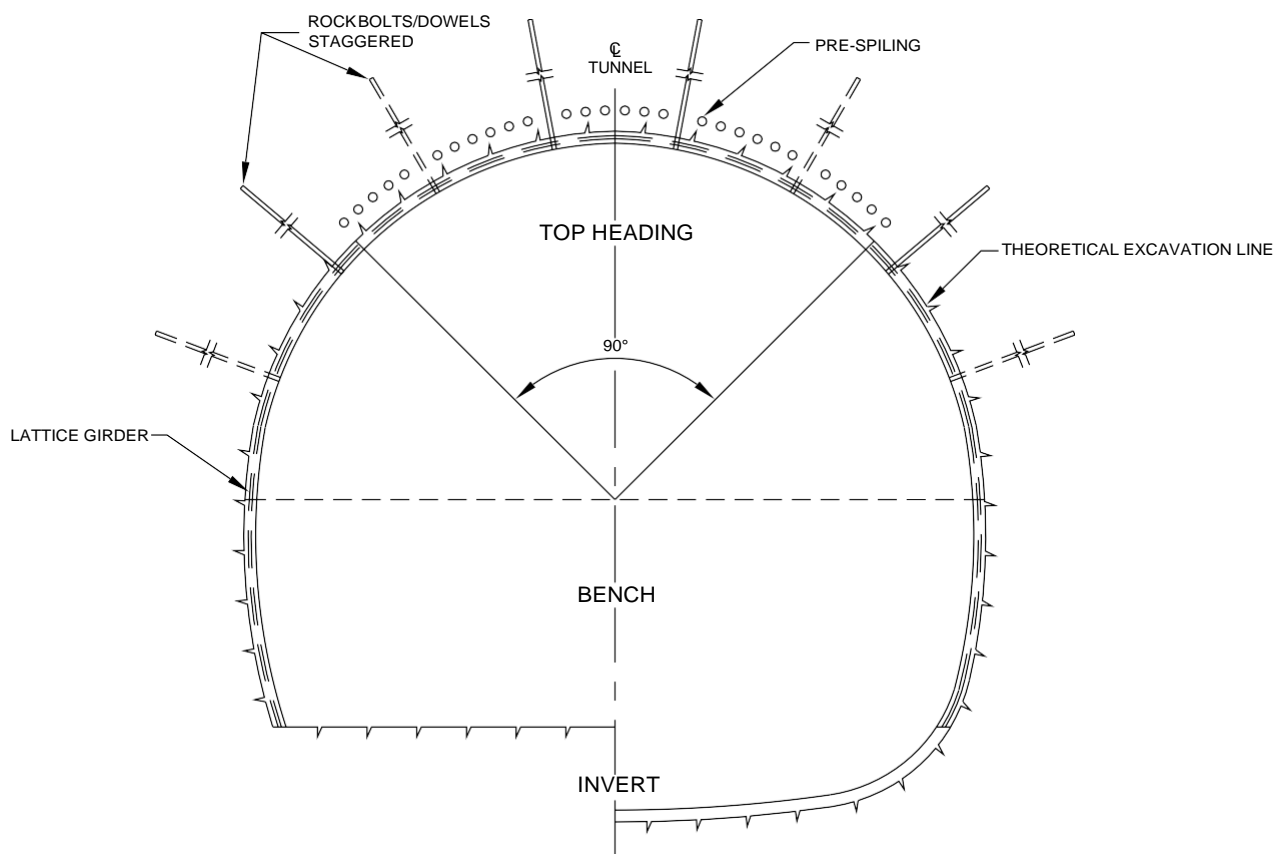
Prototypical Excavation Support Class (ESC) Cross Section
